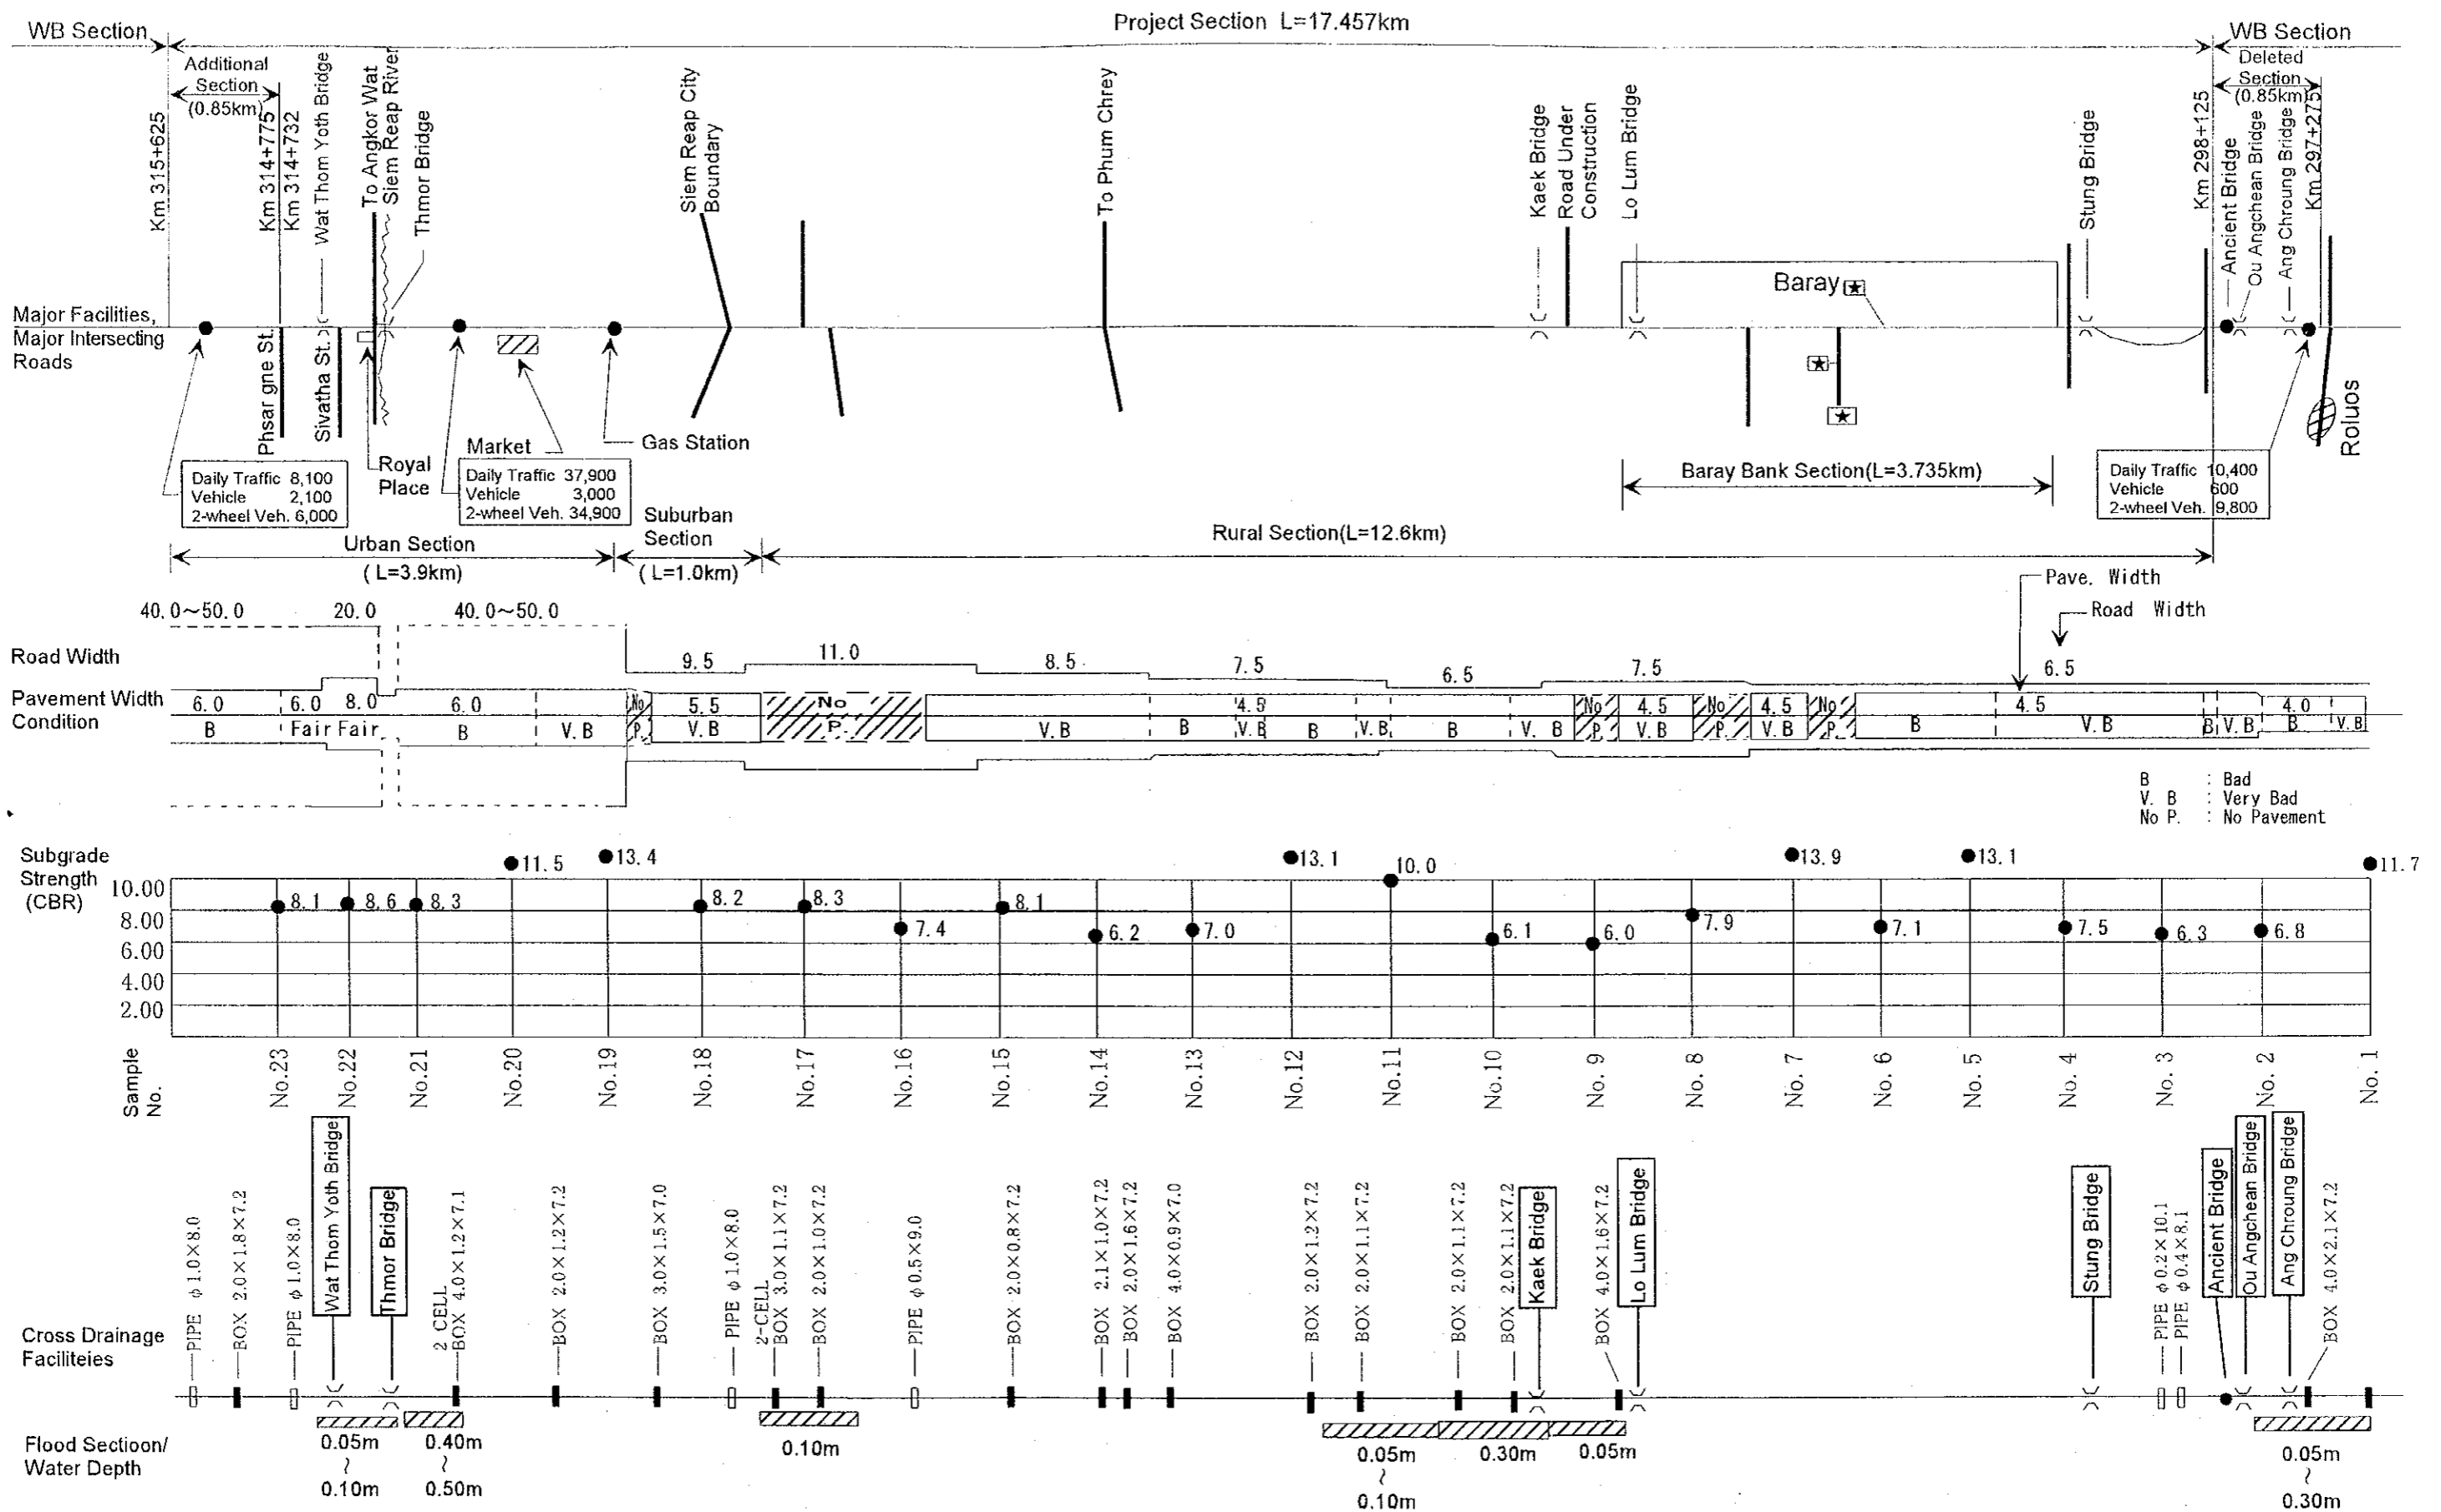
EXISTING CONDITION OF PROJECT ROAD
